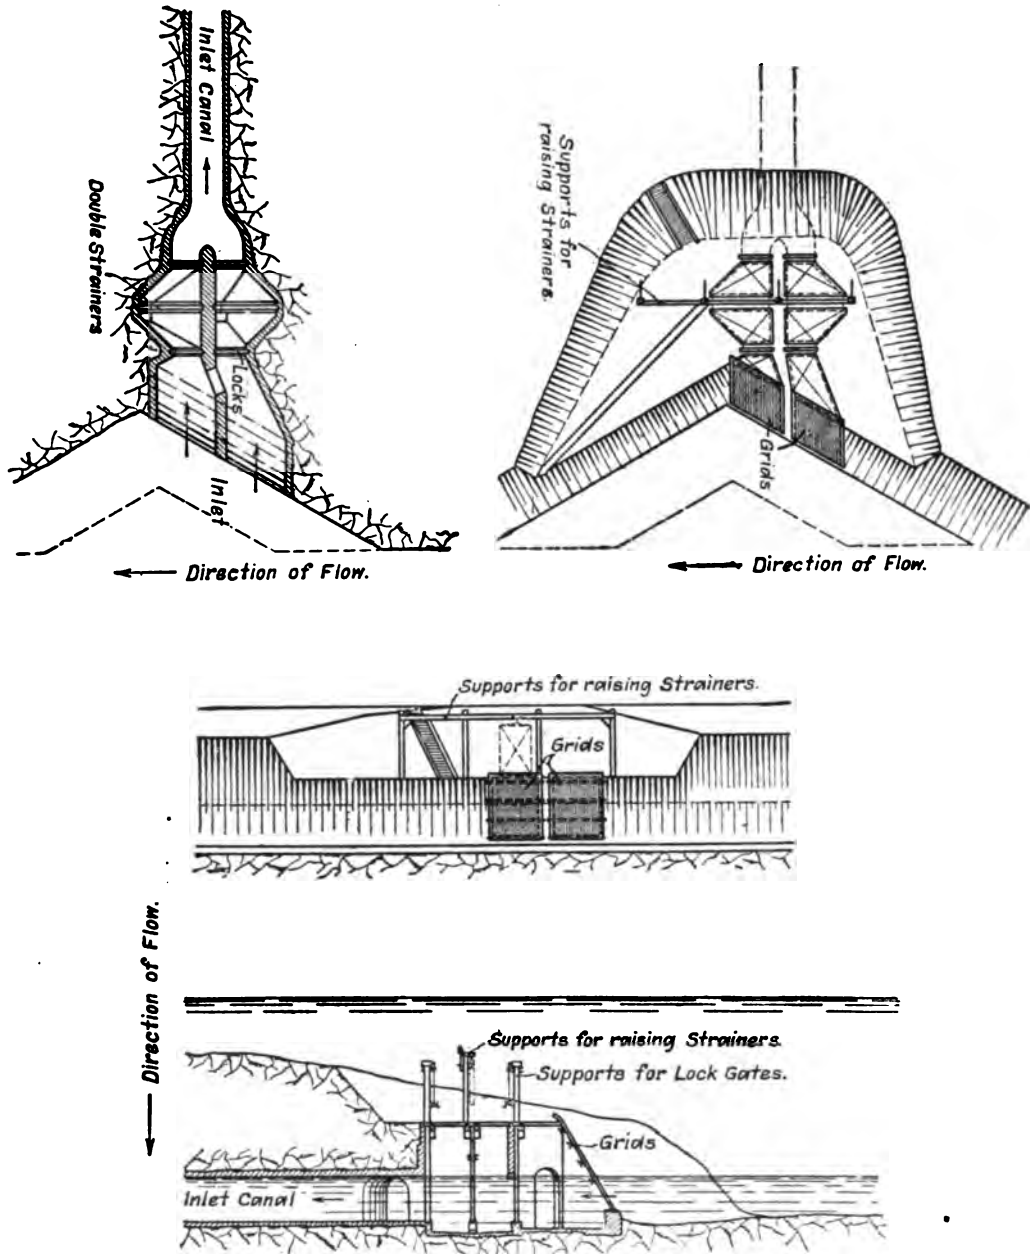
Vereeniging Power Station. Plan and Section of the Intake for the Condenser Cooling Water. Scale, 1 to 500.
